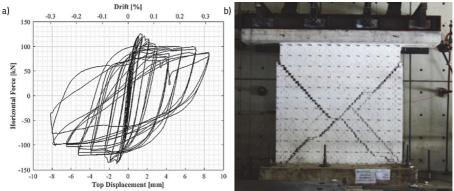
Example of an in-plane cyclic test of brick masonry wall: a) force-displacement hysteretic curve; b) shear failure mechanism ([25])
